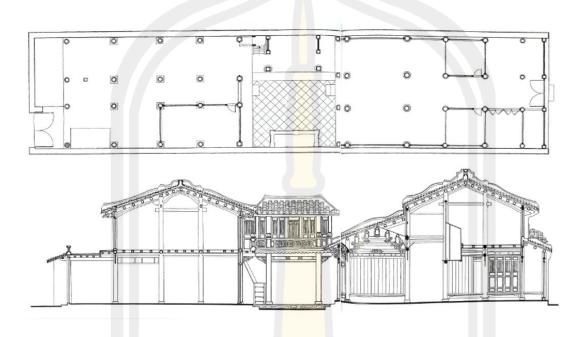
Plan of the first floor and cross-section of the house (status 1983). Source:
